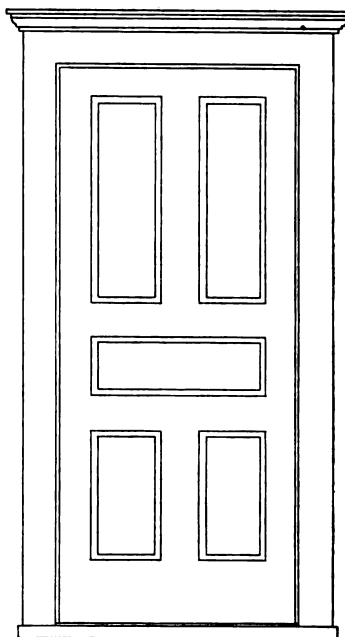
The Door and Frame Completed.—Scale, $\frac{1}{4}$ Inch to the Foot.
